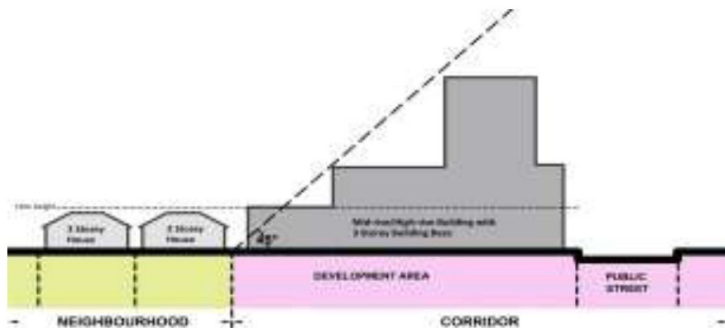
Angular plane when a street does not separate Neighbourhood designation from Centre or Corridor. A building structure up to 10 metres in height may protrude into the angular plane.
